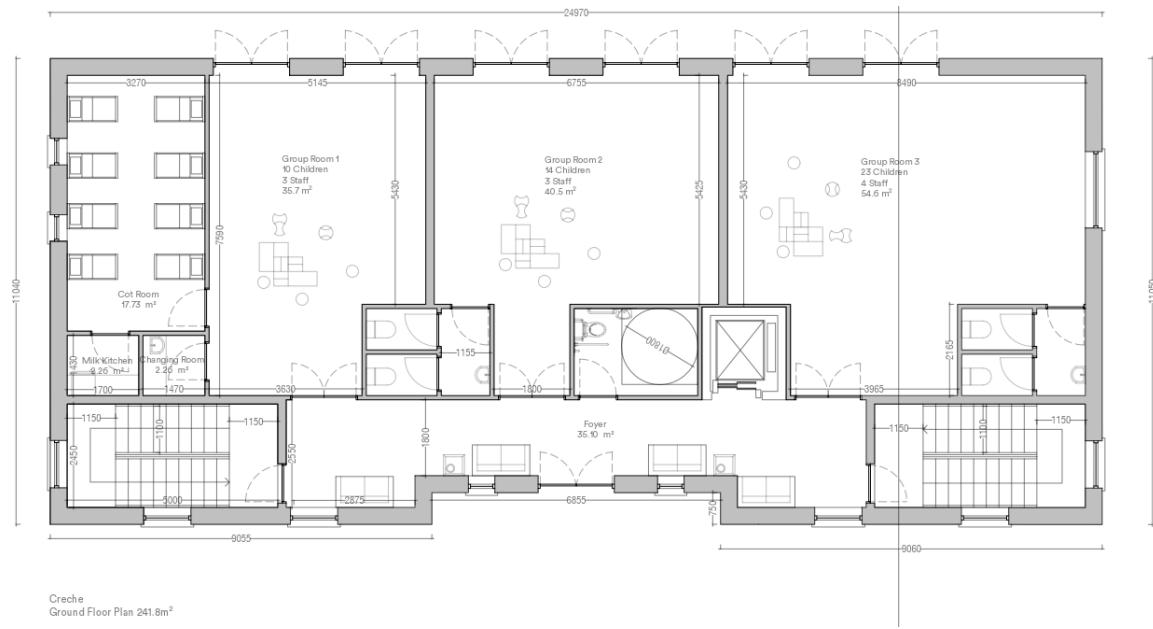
Extract from JFOC drawing - Ground Floor Creche Plan
